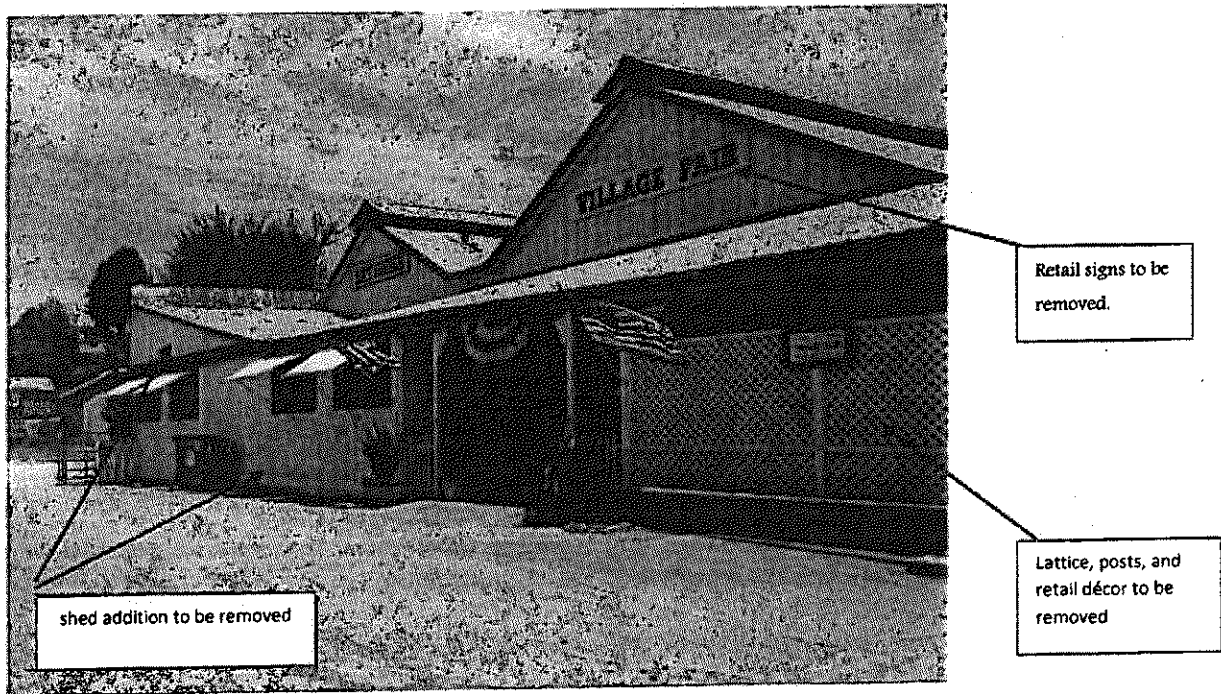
Village Fair Antique Stores, (Hilmi's Apple Barn) Facing Trout Gulch Road Apple Barn is behind decorated porches. Note the differential foundation levels west to east. Date . September 2009
